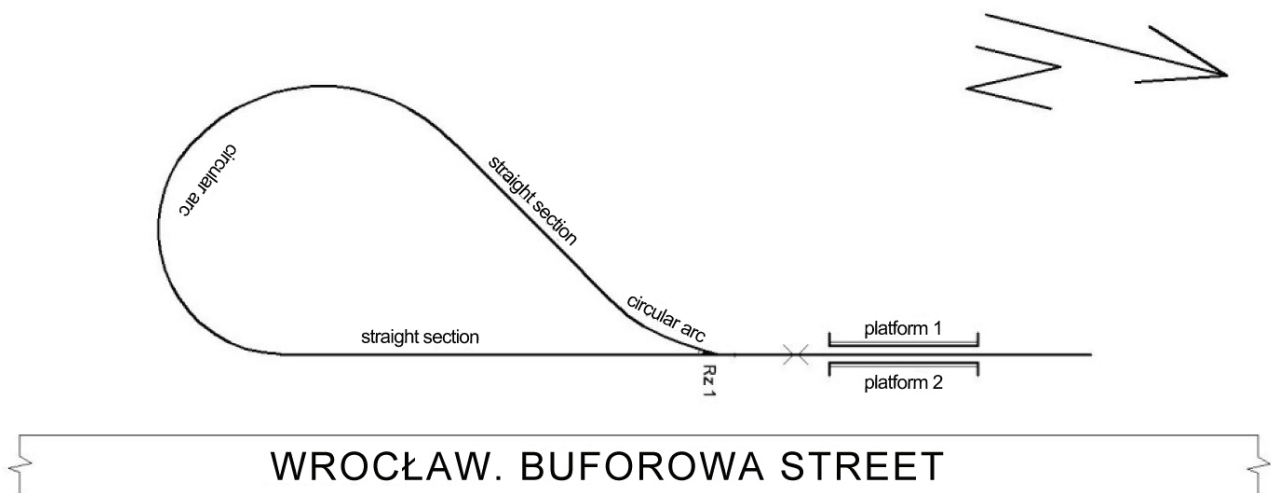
The site plan (scheme) of the proposed tram loop for a single-track line.
